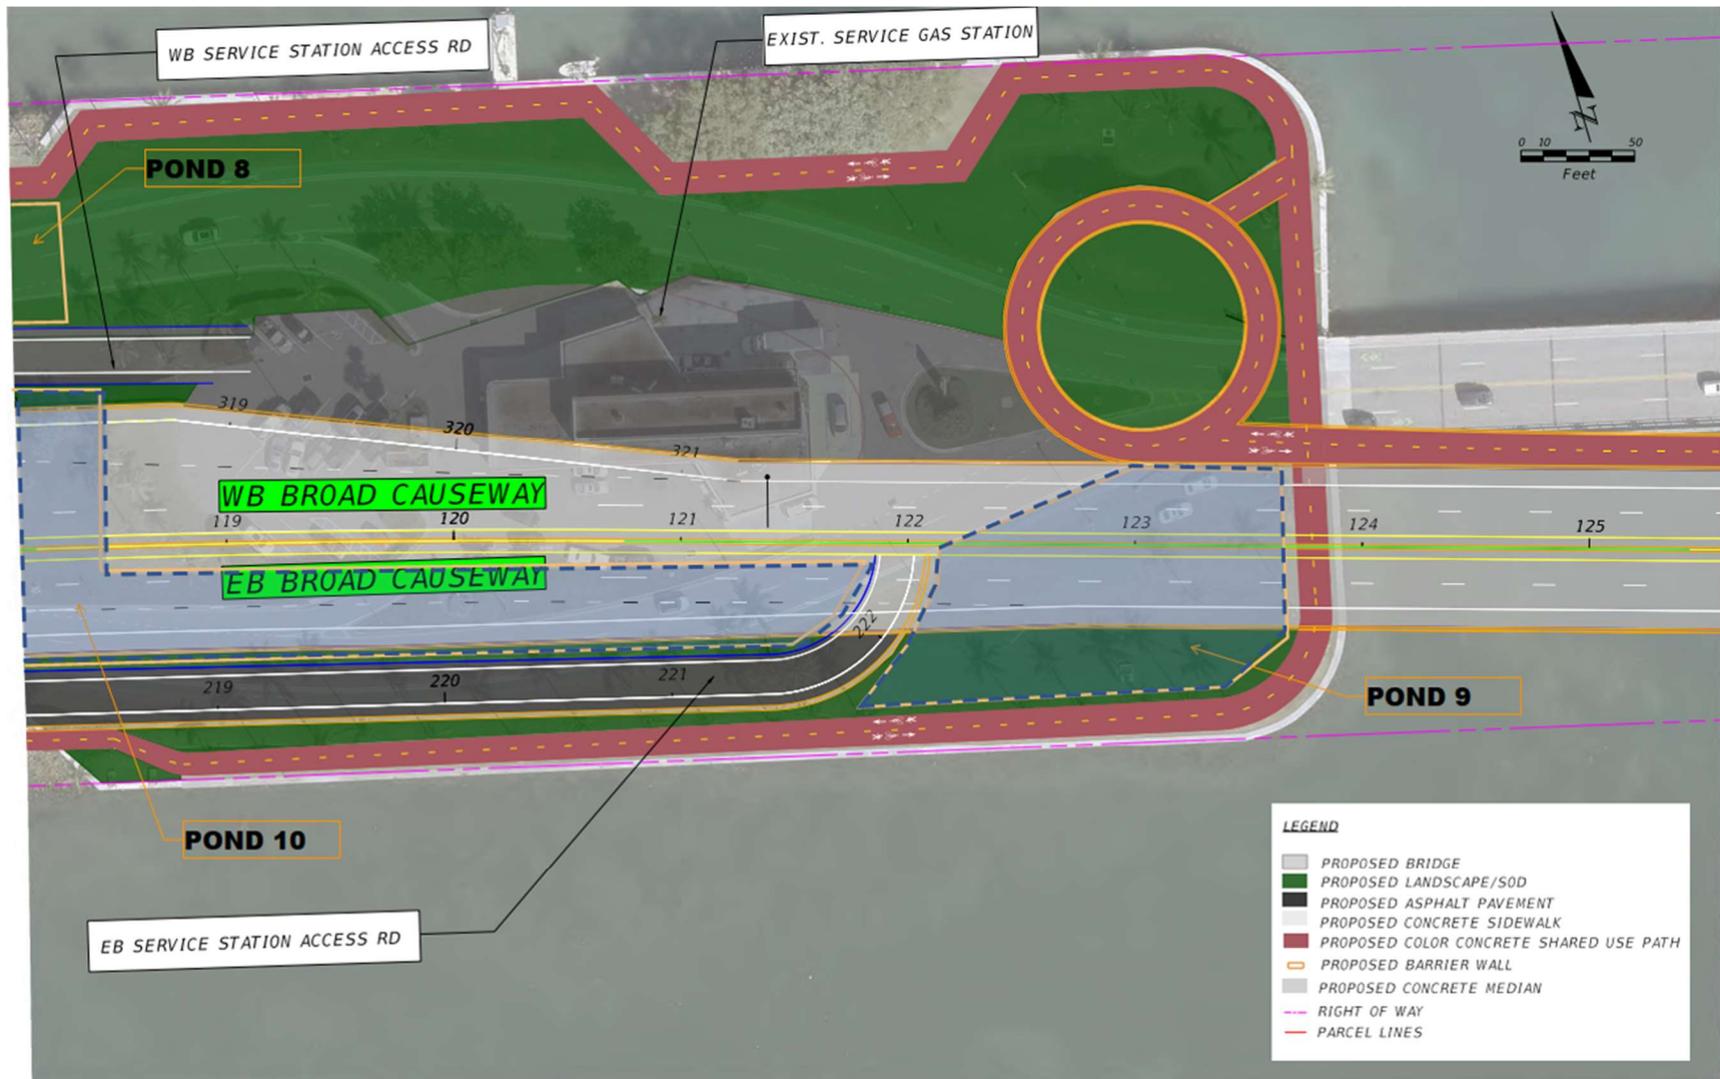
Layout of Retention Ponds on the Causeway Island (3 of 3)
